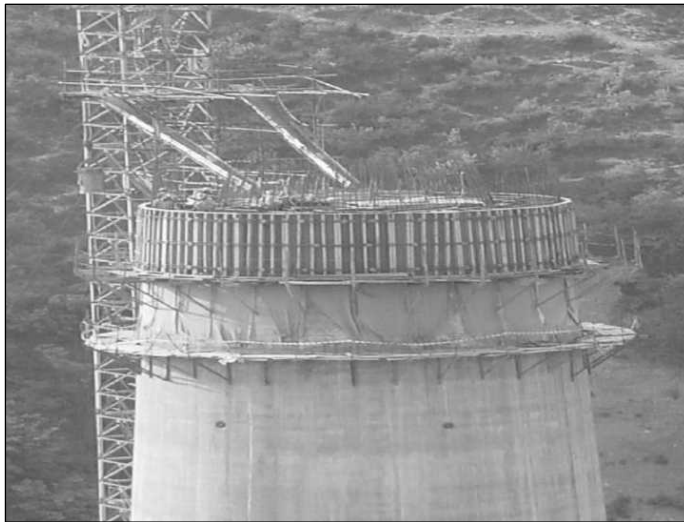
Closer View of Construction of Pier Using Climbing Form (Jammu Udhampur Rail Link Project).
